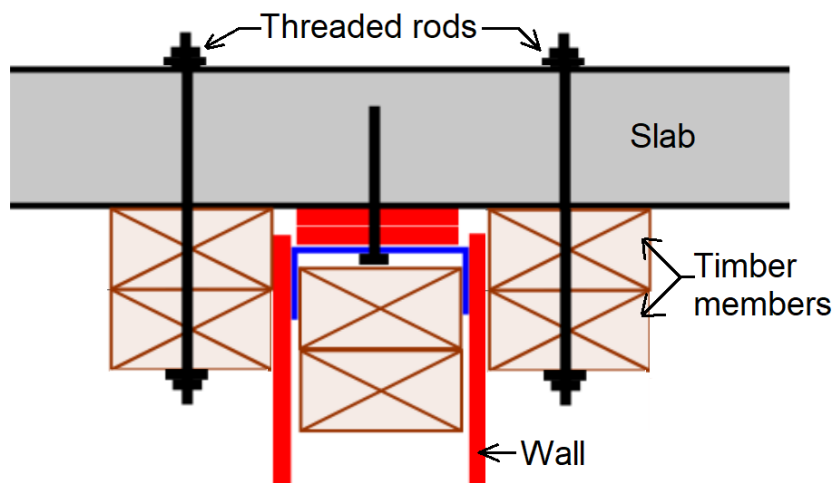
Side view of restrained ends of timber wall (steel wall similar)
